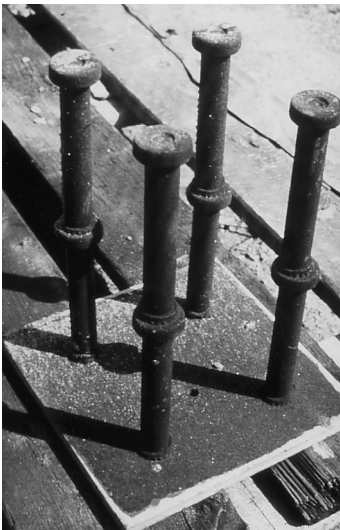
Steel embed plate with welded headed studs
